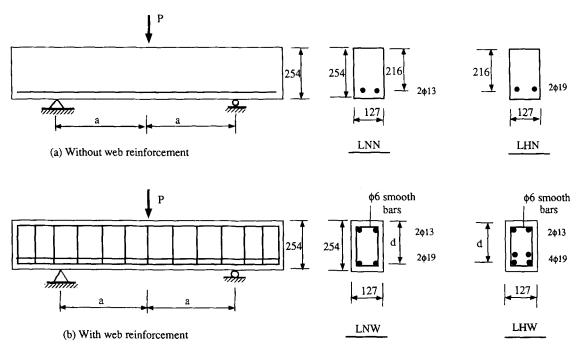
Specimen details for lightweight normal and high strength concrete beams (all dimensions are in mm).
